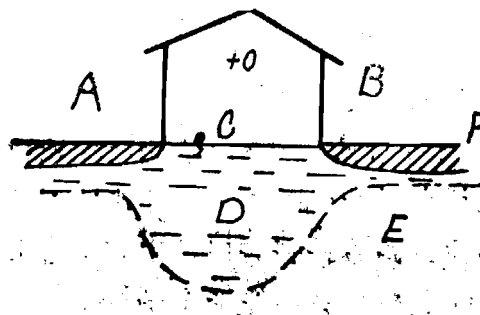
Schematic Diagram Showing Water Entering Heated Building
